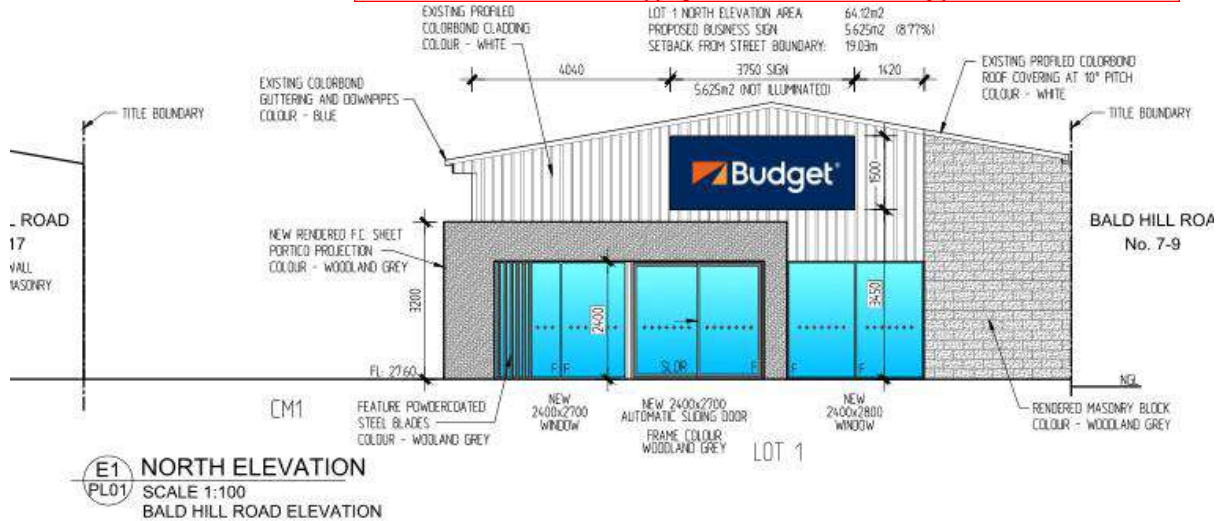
Porch extension to facade, 15 Bald Hill Rd (source Architectural Plans)
